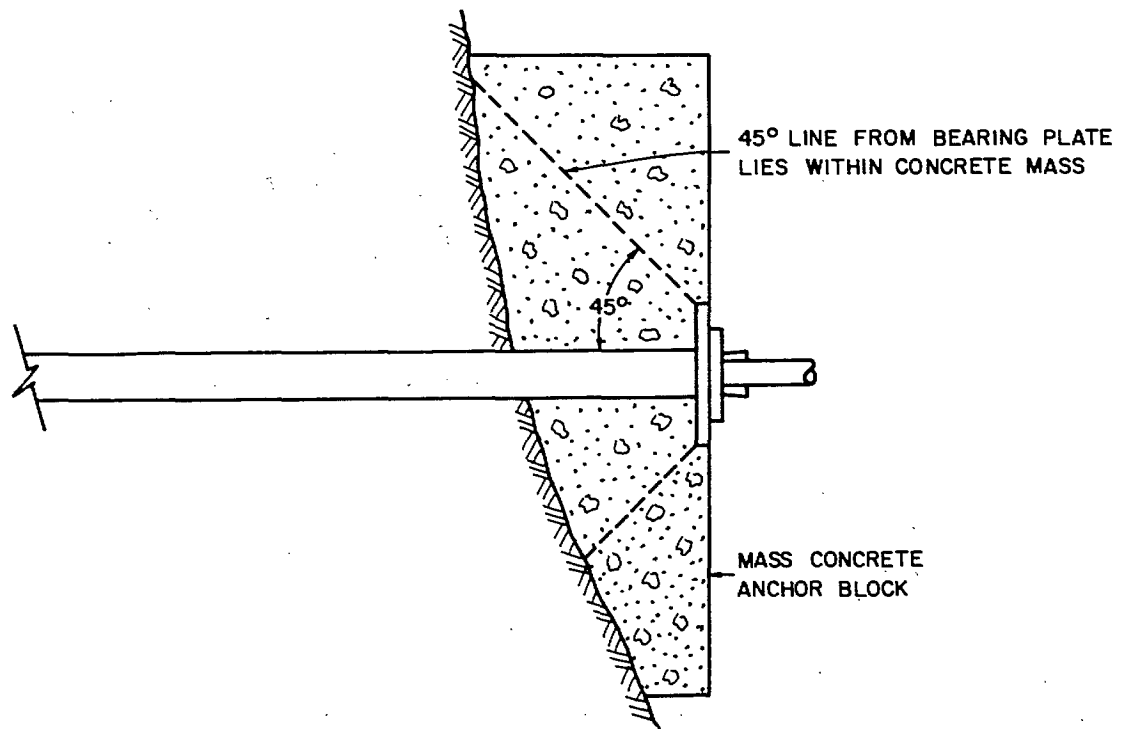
Mass Concrete Block to Support Anchor Head on Weak Rock.
